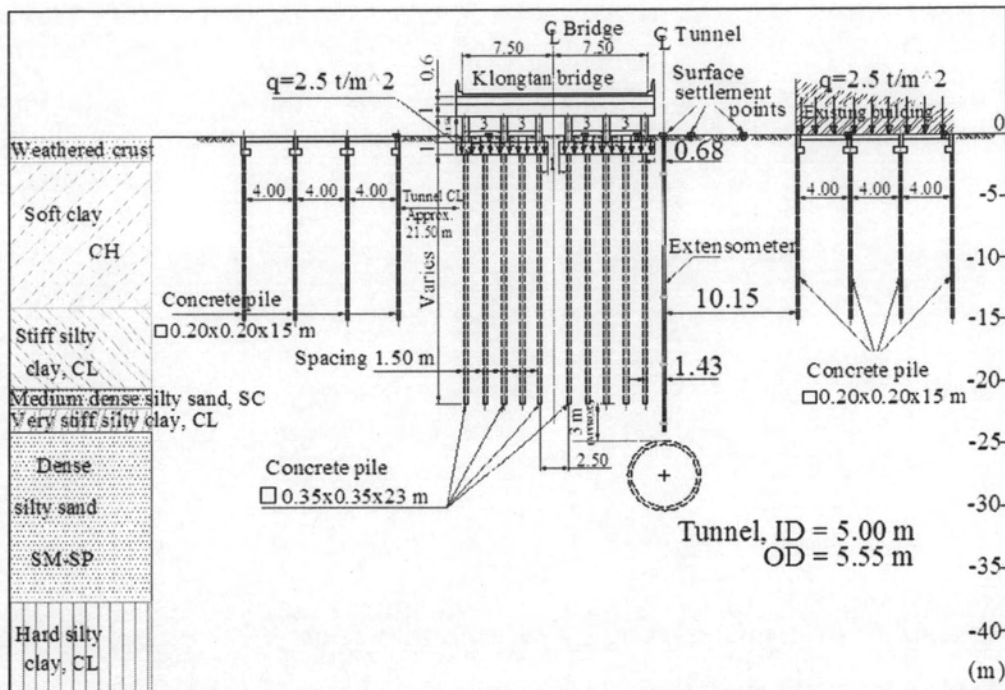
Subsoil profile at Klongtan Bridge area and cross section (section AA)
